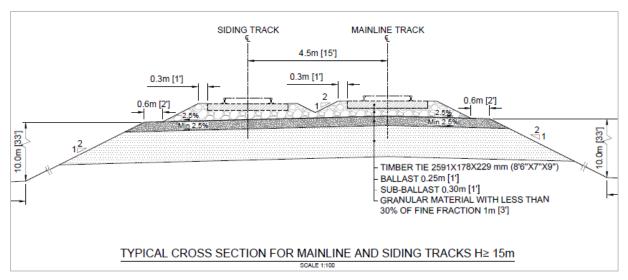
Typical Cross Section for Embankment over Good Ground Conditions
